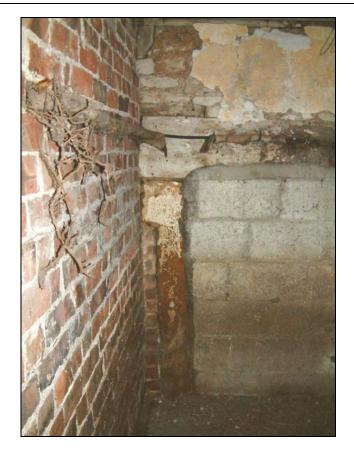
Barn 1 fireplace with break from addition of modern brick wall
